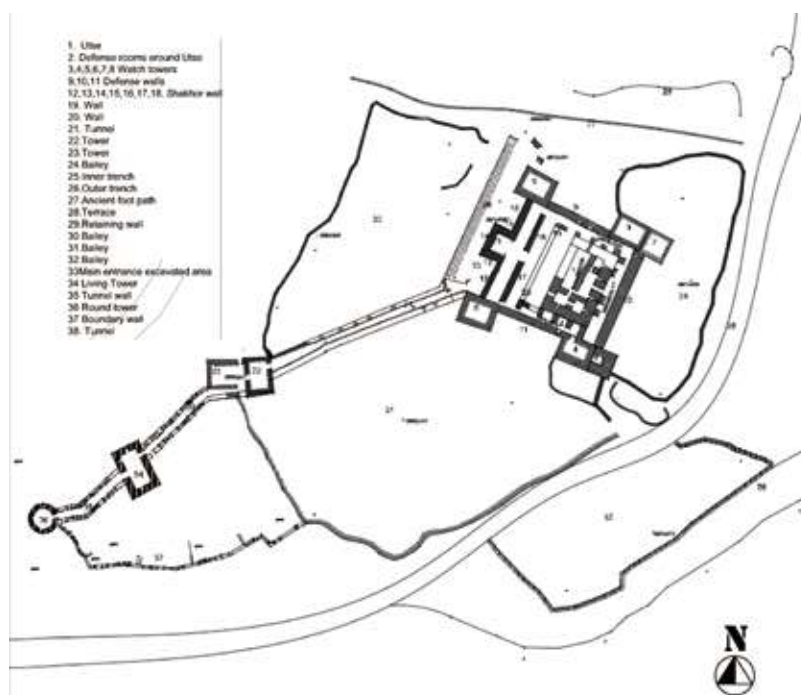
Layout plan of the Chubjakha Dzong ruin
